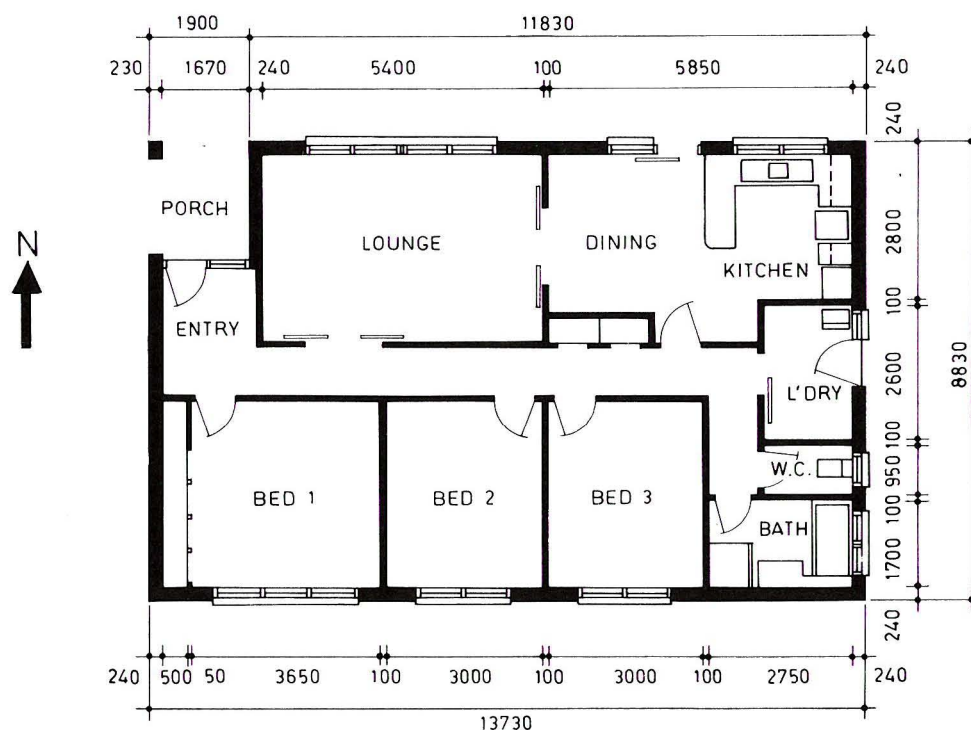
Floor plan of the house examined in this paper. Dimensions are in mm.
